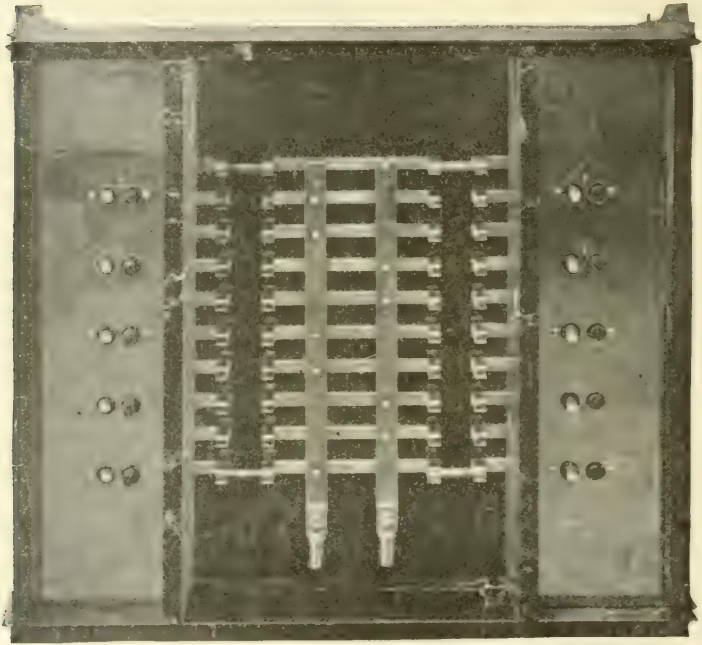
Cut-Out Panel with Push-Button Switches. Cover Removed.
